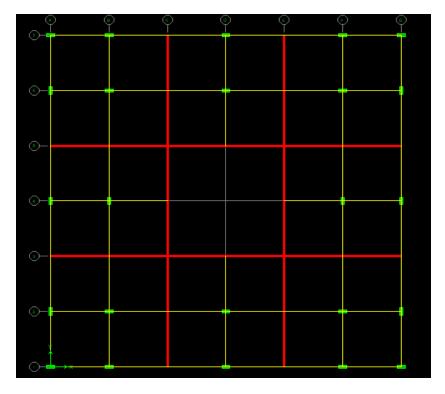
floor plan of building of model 8 with outrigger at mid height
